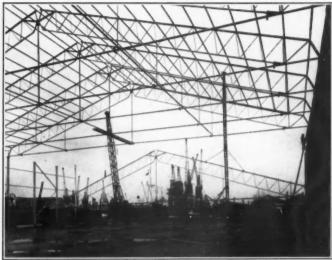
No. 5 Shed, Junction Dock, 125-ft. Span. Erection of trusses.
